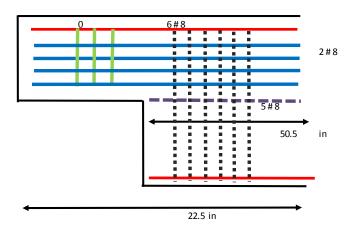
Dapped End Connection for Double T and Inverted T Beams
